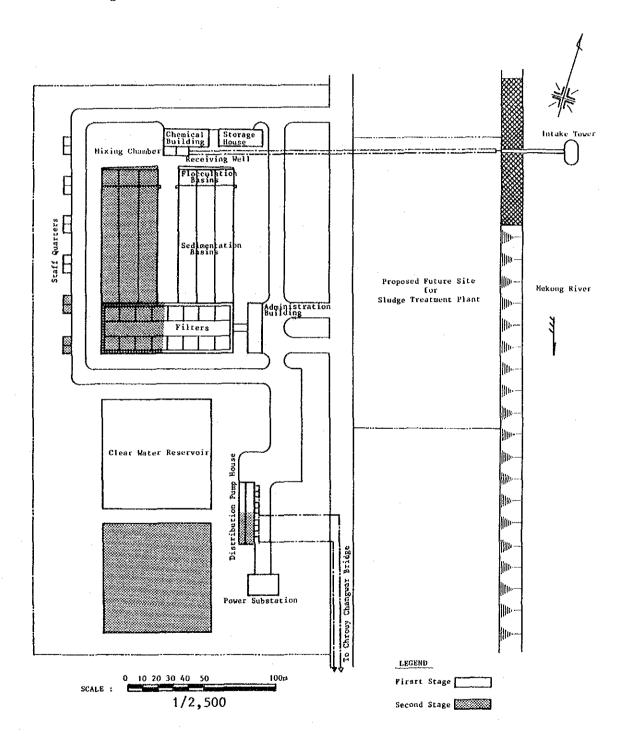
GENERAL PLAN OF CHAM TREATMENT PLANT
